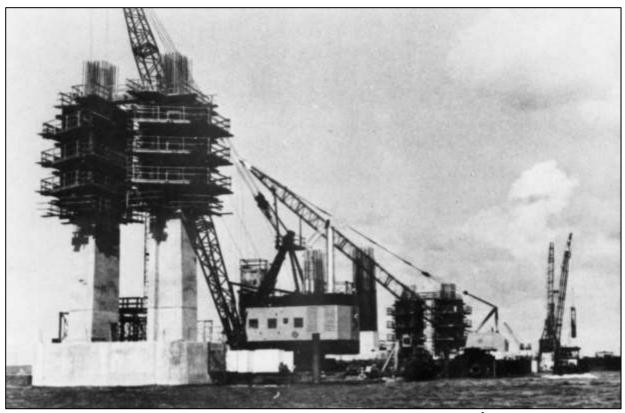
Erecting a pier using hydraulic steel slipforms in 1977.⁵
